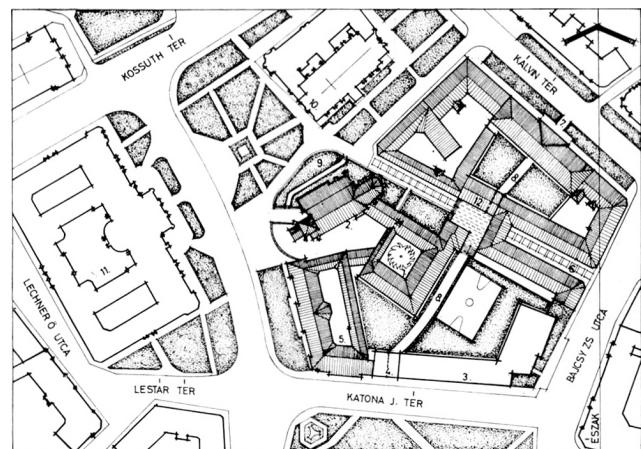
Kodály Institute and Kéttemplom Street, site plan
